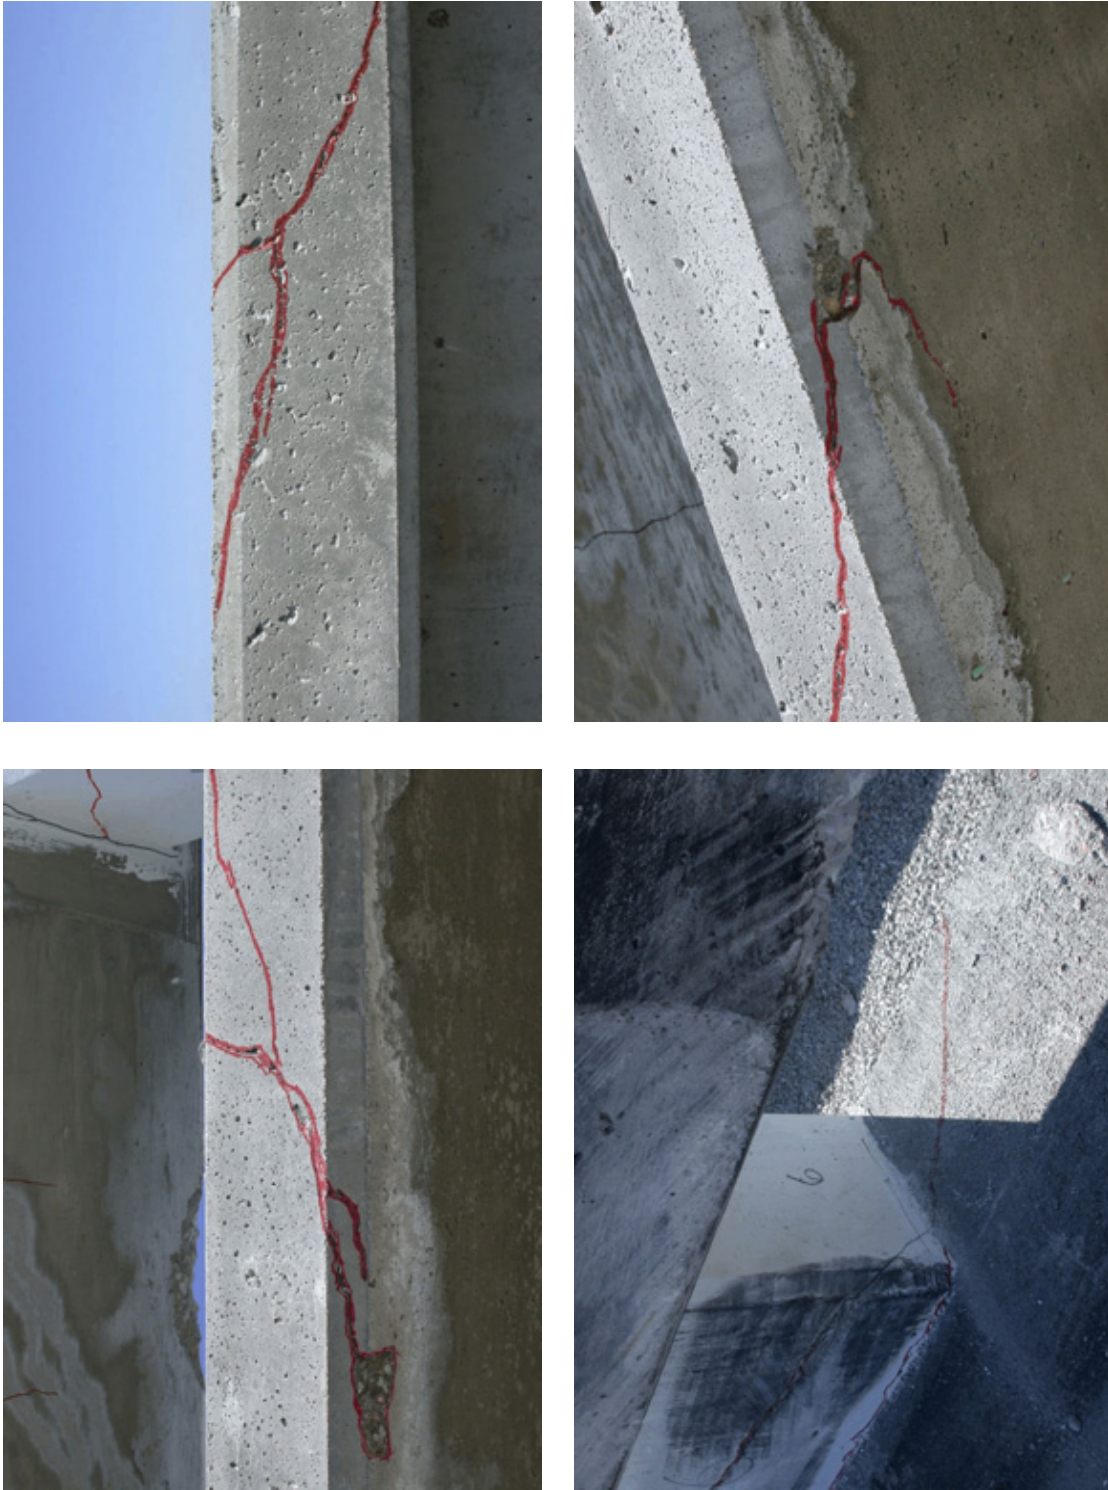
Bridge Deck Damage Around Post No. 6, Test NIT-1
